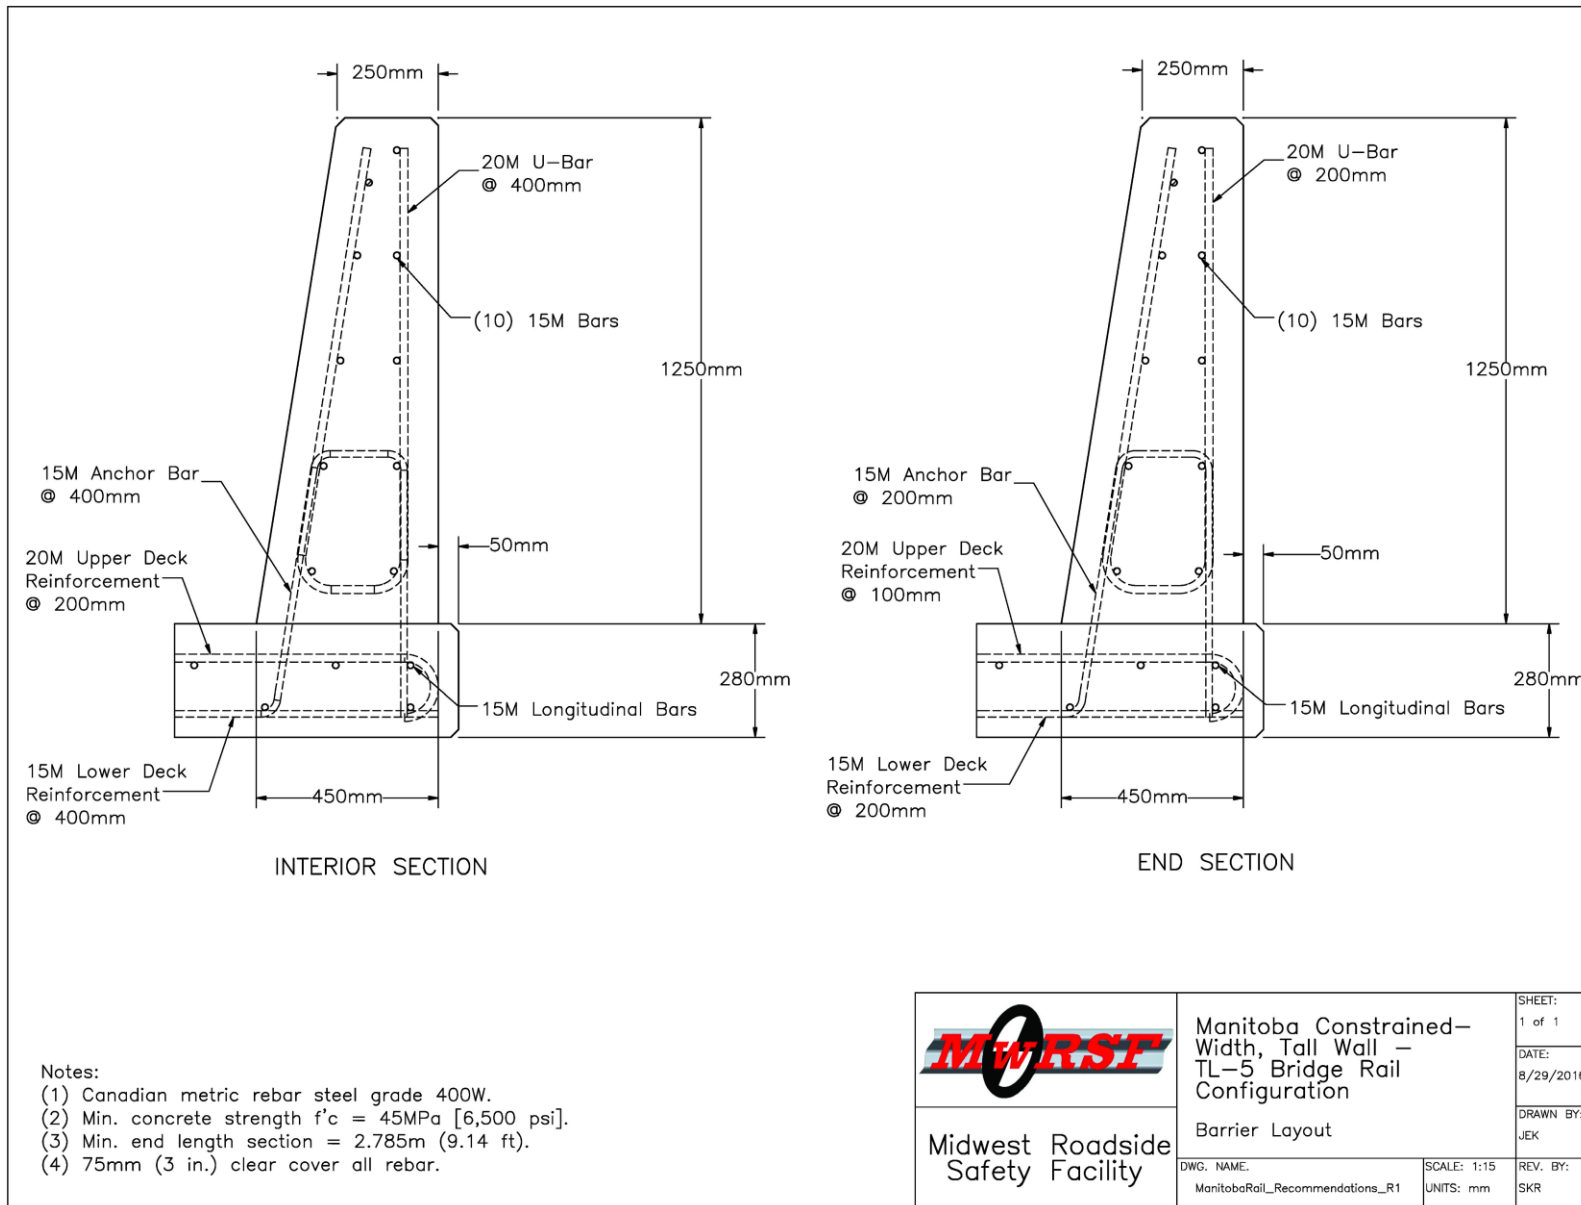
Recommended Reinforcement Configurations for the TL-5 Bridge Rail
